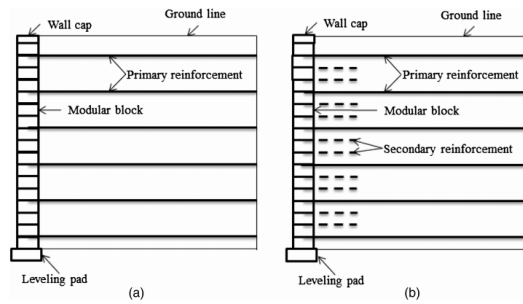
Cross section of MSE wall: (a) MSE wall reinforced with primary reinforcements; (b) MSE wall reinforced with primary and secondary reinforcements
